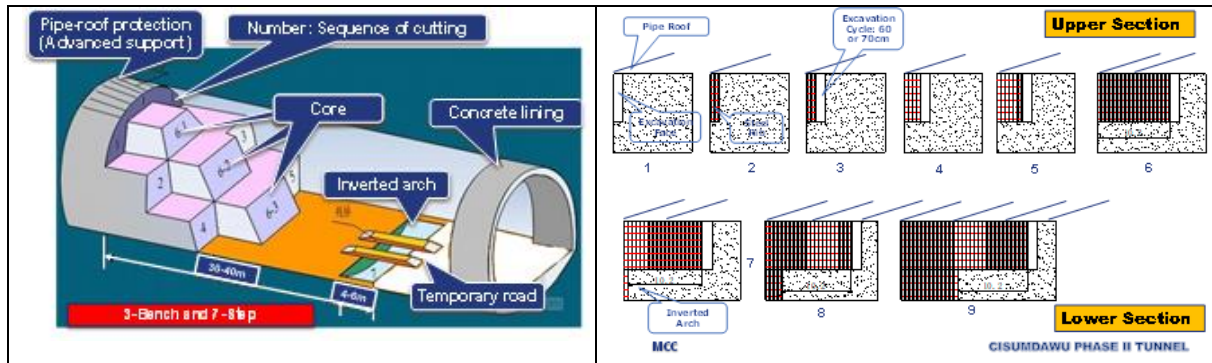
Excavation stages of 3 bench 7 steps method of Cisumdawu tunnel project [3].
